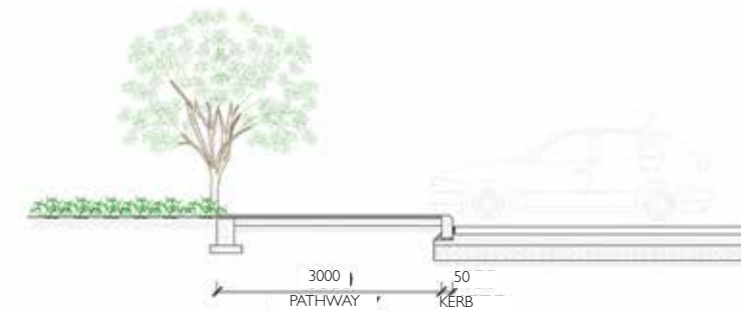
Parking Lot kerb-150mm. high kerb adjacent pedestrian walk. (County of Los Angeles : Department of Parks and Recreation Planning & Development Agency, June 2014, p.15)
